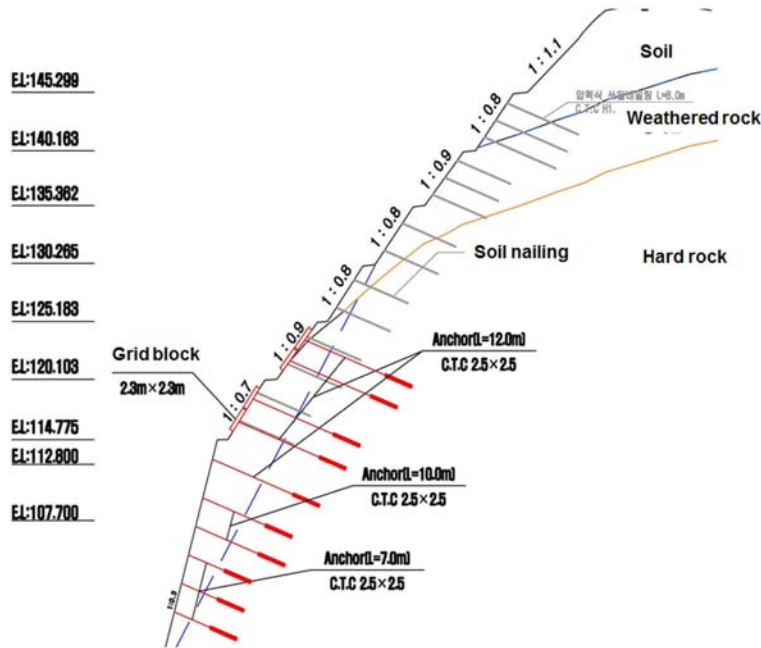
Cross-sectional view of slope stabilization using a grid of anchor blocks. Note that the grid block spacing is 2.3 × 2.3 m.
